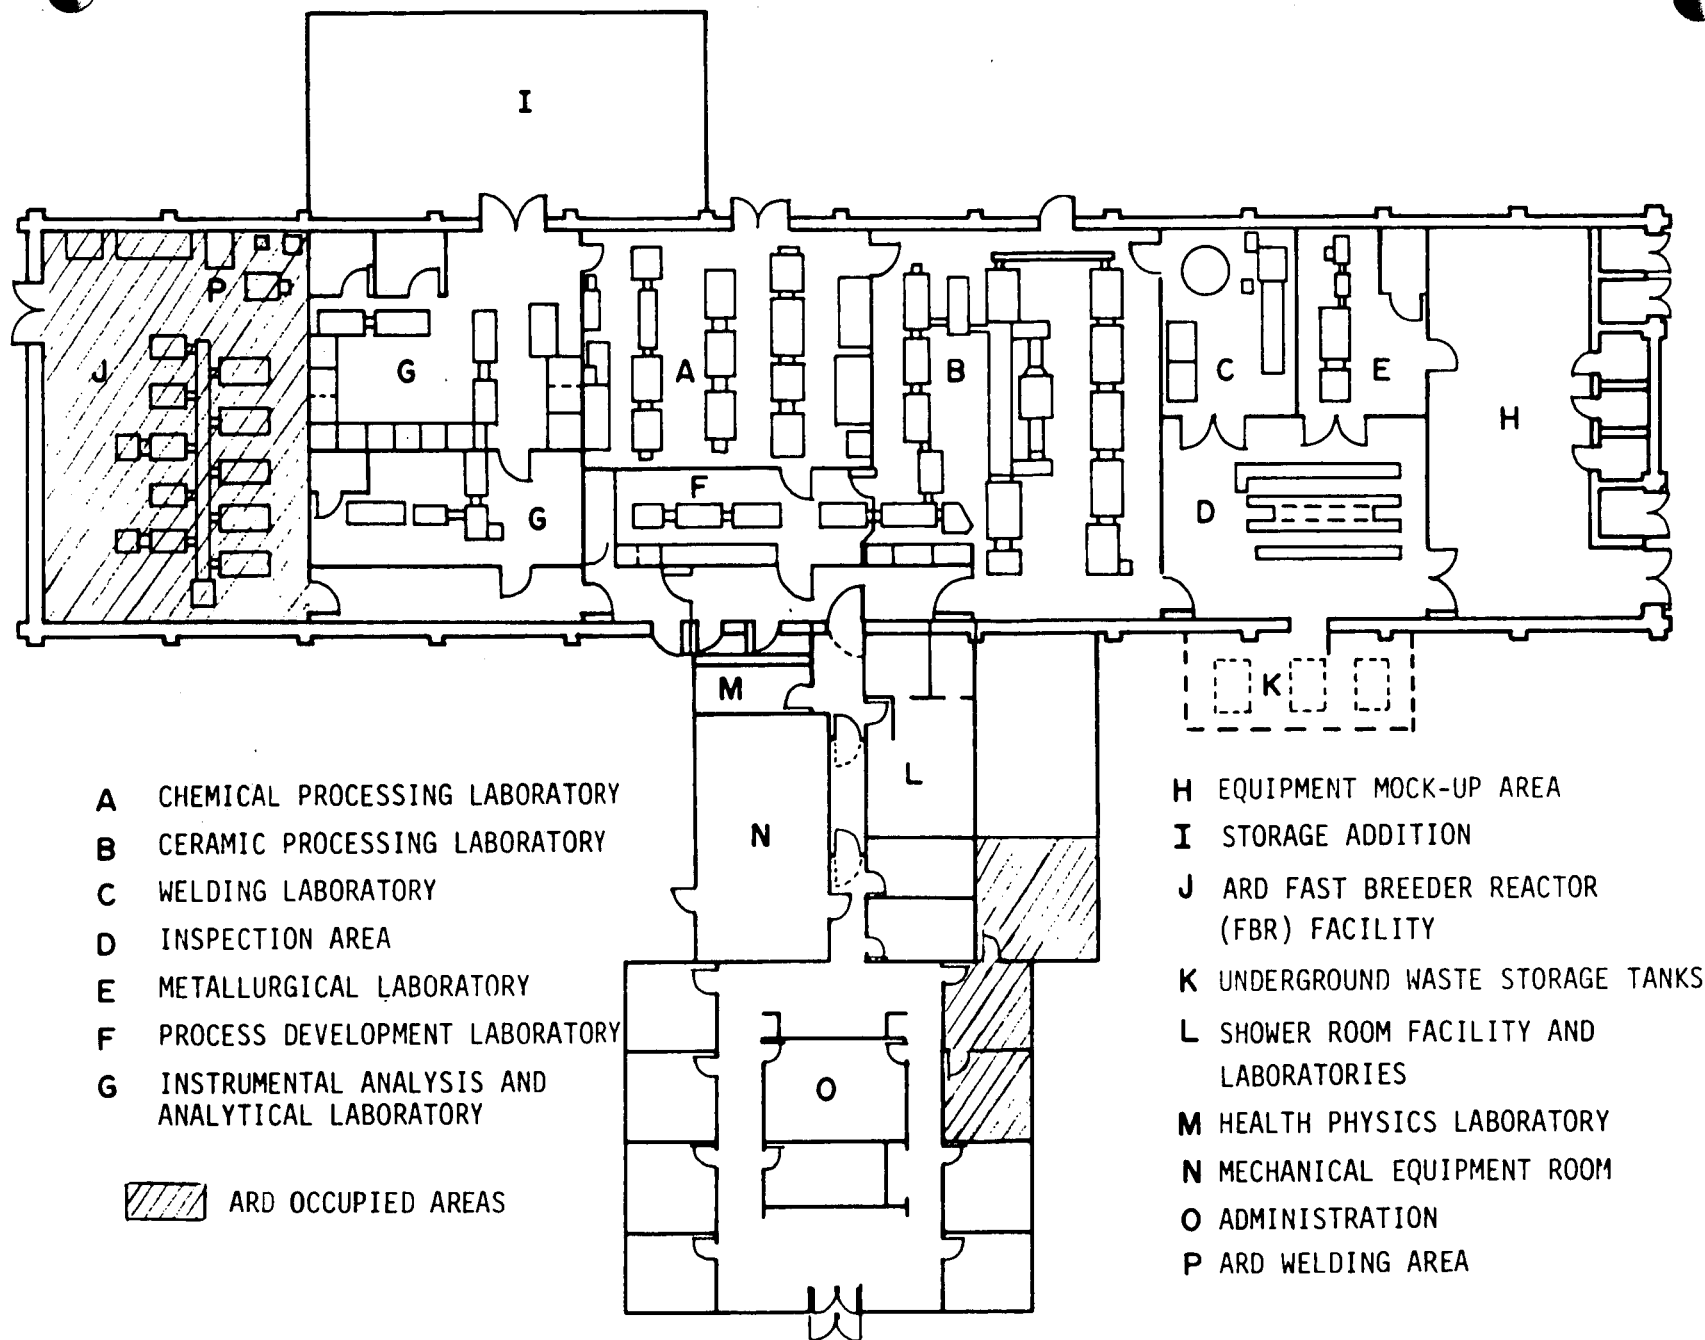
PFDL (BUILDING 8) FLOOR PLAN
